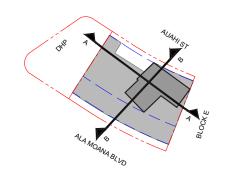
BUILDING AND PODIUM SECTIONS (LONGITUDINAL)
